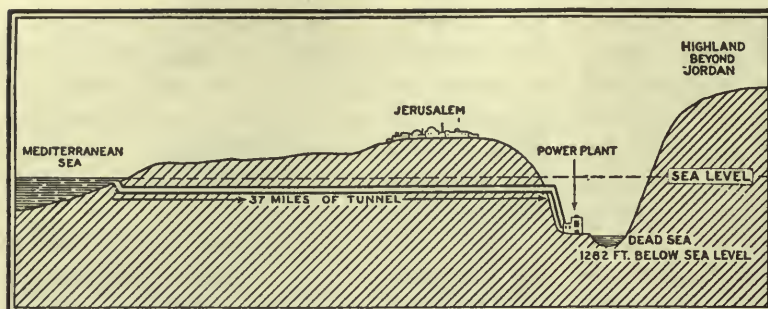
The plan for one of the longest tunnels and greatest power plants in the world. (Sec. 567.) What will limit the amount of water that can be used?
